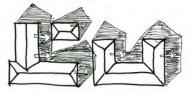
Corner and through units facilitate natural ventilation and daylight access.
